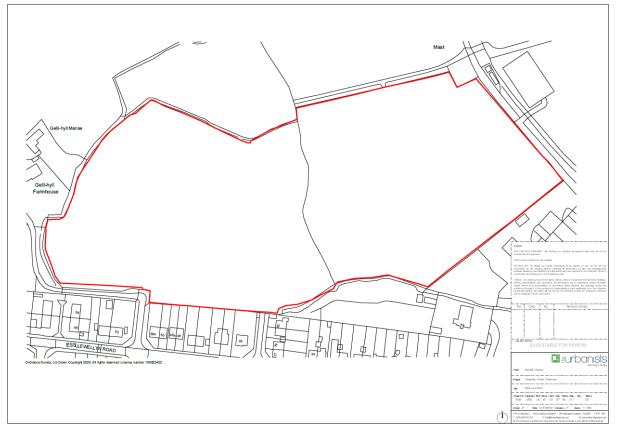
Proposed site location plan courtesy of the Urbanists Planning & Design
